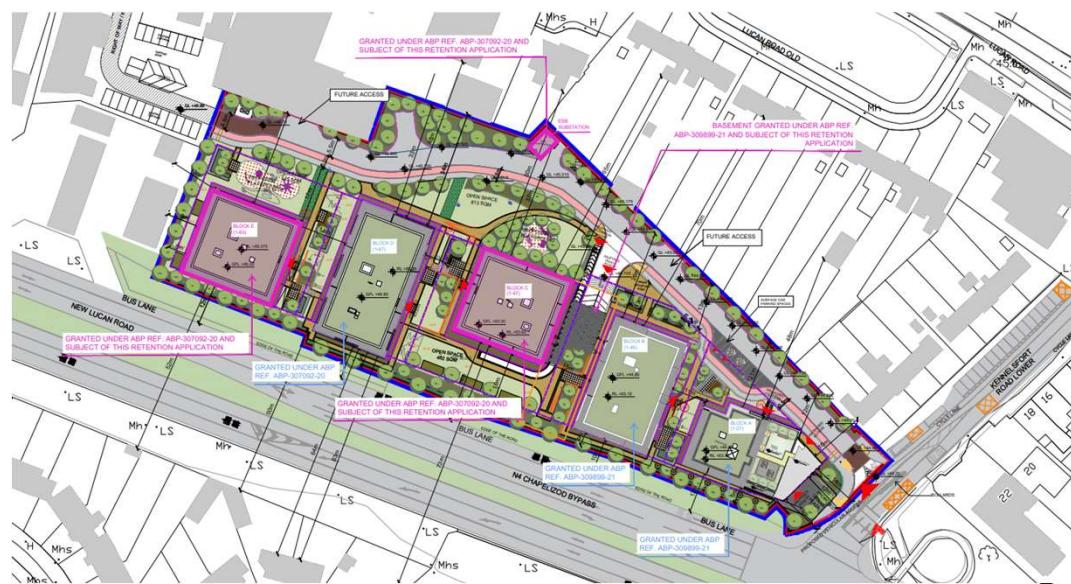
Existing Site Layout Plan – Extracted from Existing Scheme
